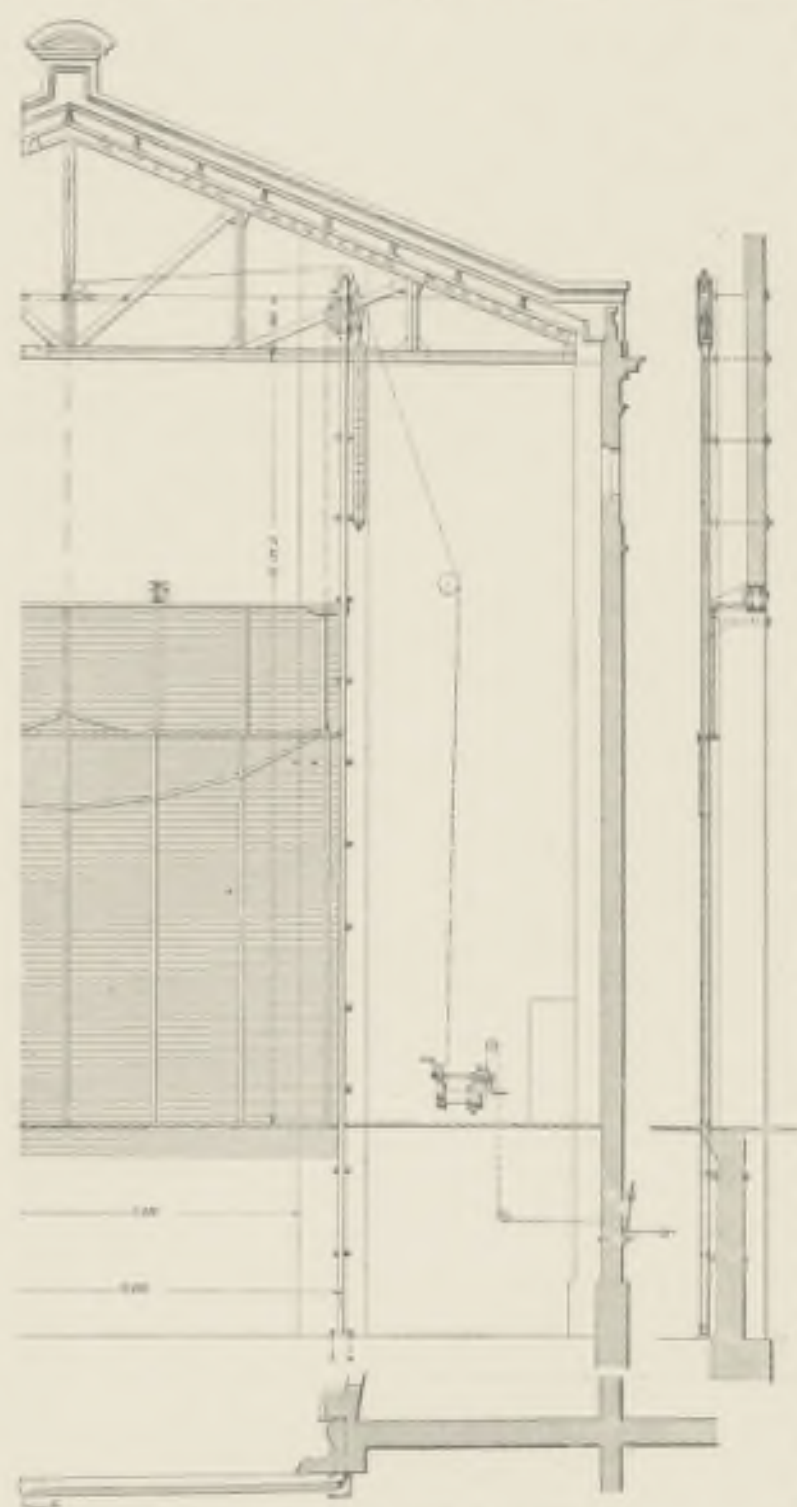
TO 621. FIRE-RESISTING CURTAIN: PLAN, ELEVATION, SECTION AND DETAILS.
